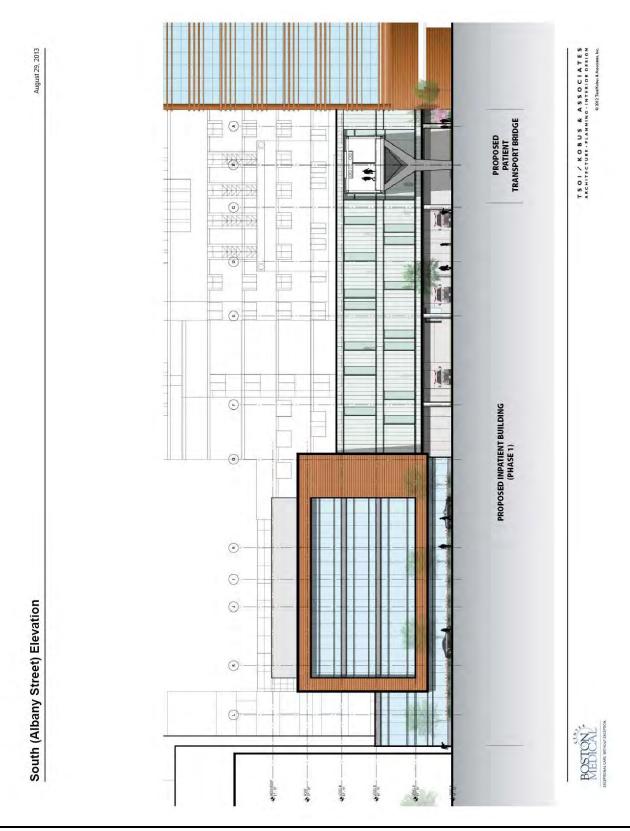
New Inpatient Building Phase 1 South Elevation
